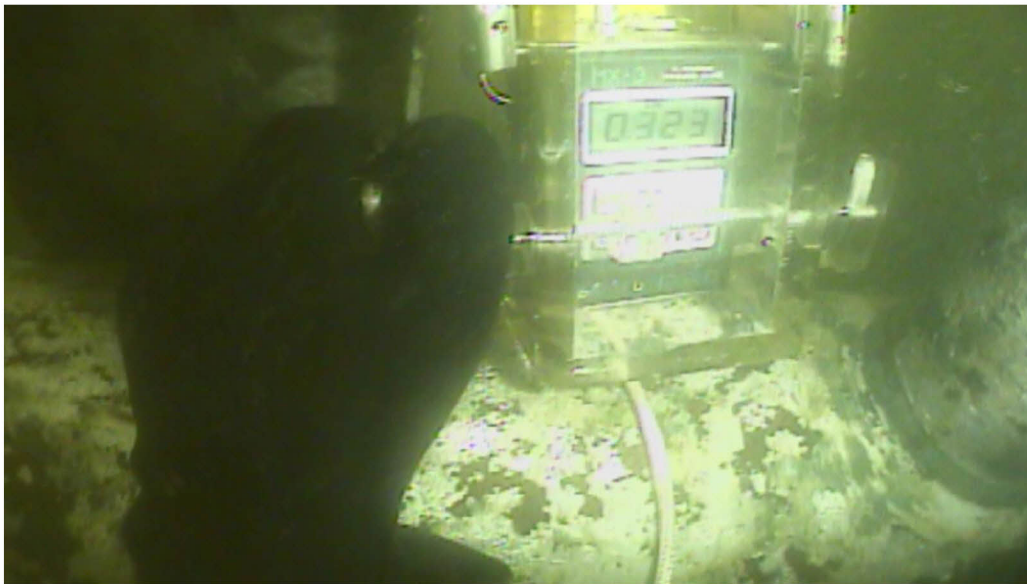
8” Outfall pipe flange connection, clean and in good condition
